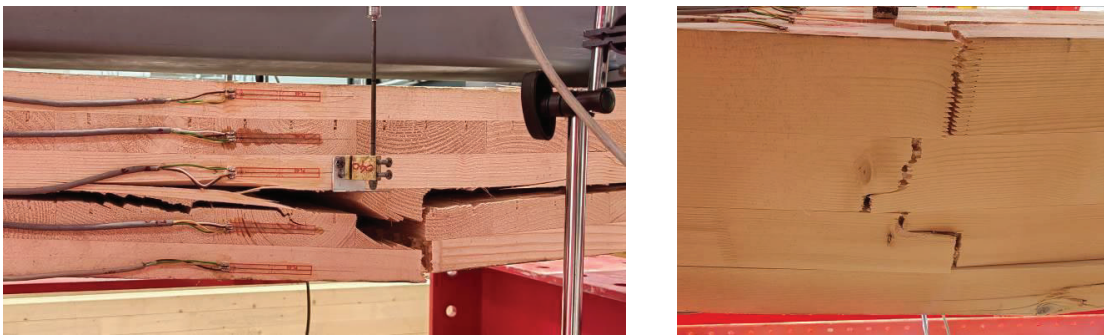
Typical failure mode of the Series A unreinforced panels (Specimen A2)
